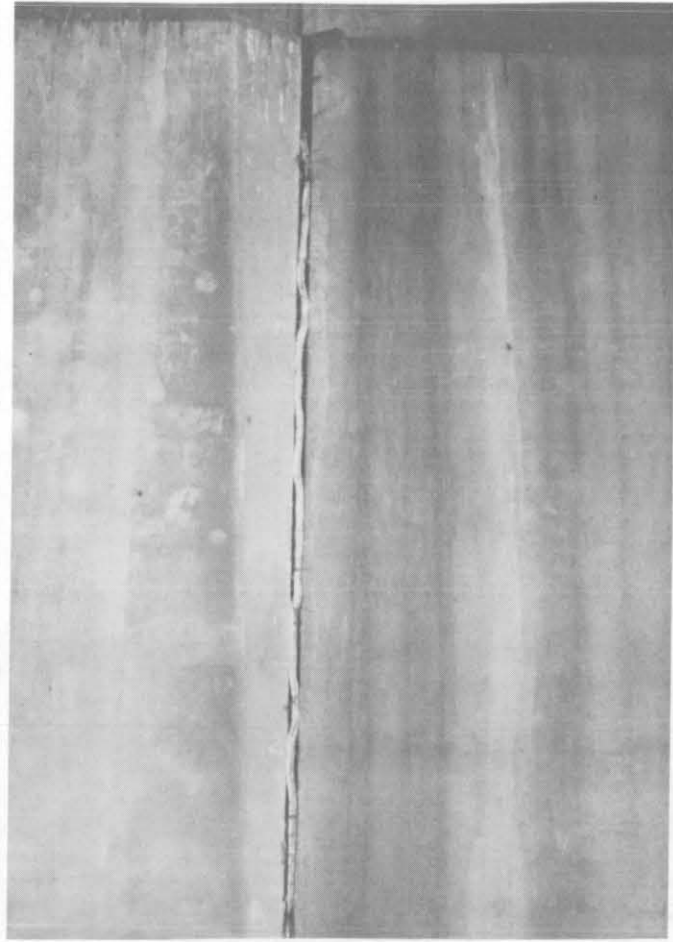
Opening of construction joint in abutment as result of differential settlement.
